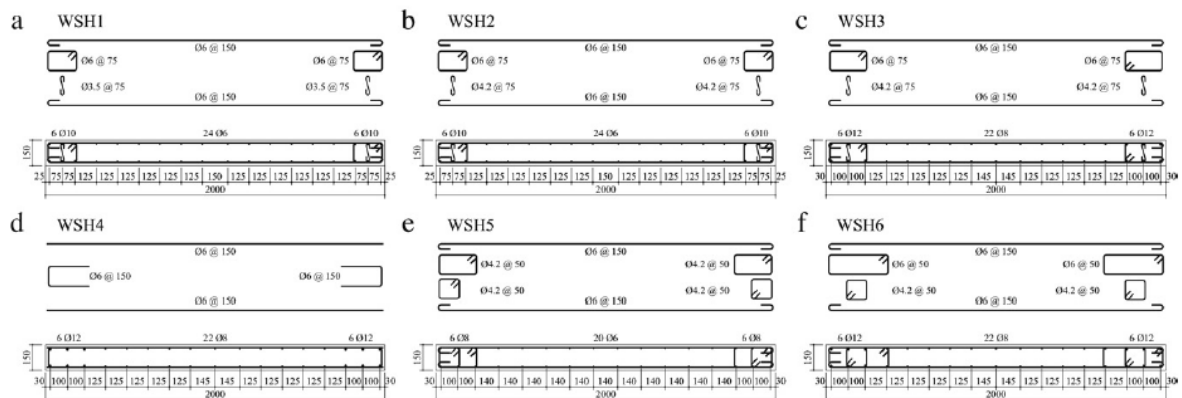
Reinforcement layout in the plastic zone of the test units (All dimensions in mm) (Dazio *et al.* (2009))
